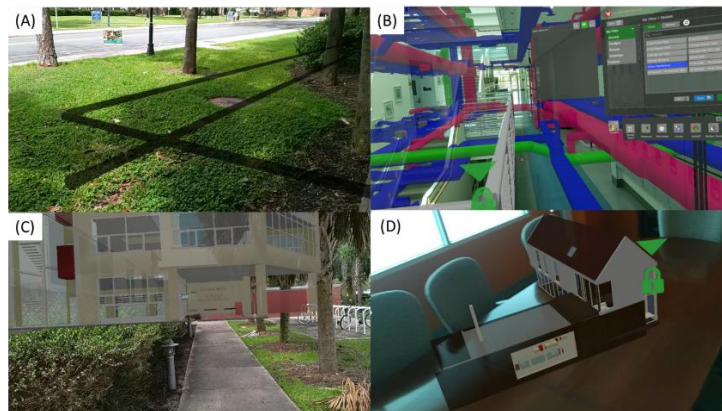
Examples from the visualization on HoloLens (A) Underground pipes (B) Building mechanical systems (C) Hall exterior (D) Tabletop sample model
